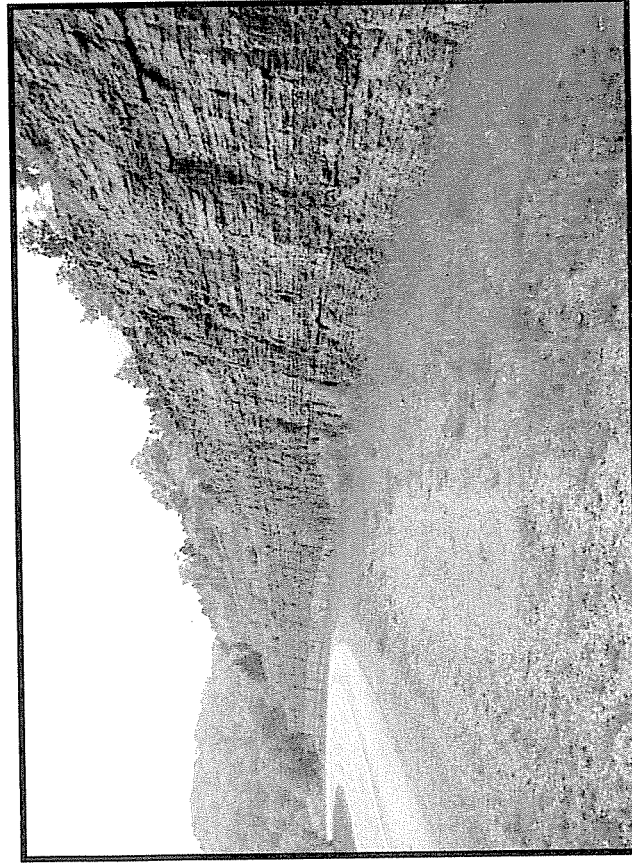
Segment 2 (U.S. 127), facing southeast from STA 72+00. (5-16-2007)
